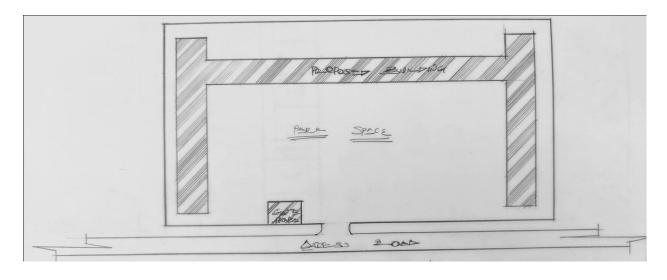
SITE PLAN OF CASE STUDY TWO
